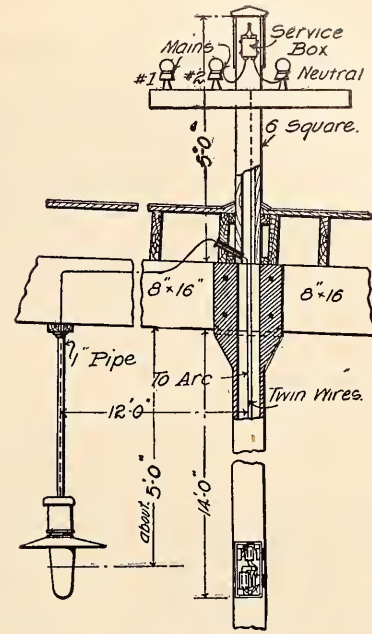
ARRANGEMENT OF LIGHTING WIRES IN ROUNDHOUSE—C. & E. I. R. R.
